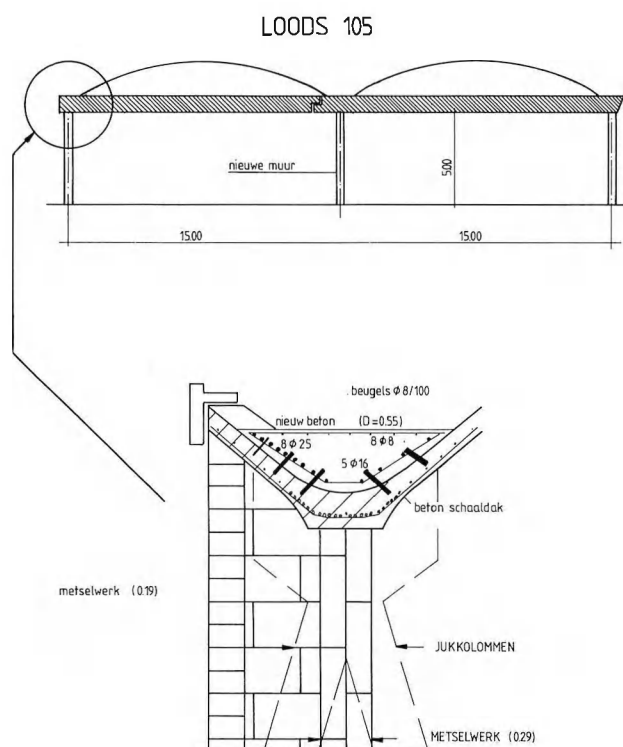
Shed at quay 105. Shell roofs — Fitting of edge beam.
